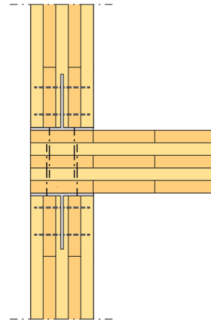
W2F joint: Slotted-in steel plates. (Swedish Wood, 2019).
